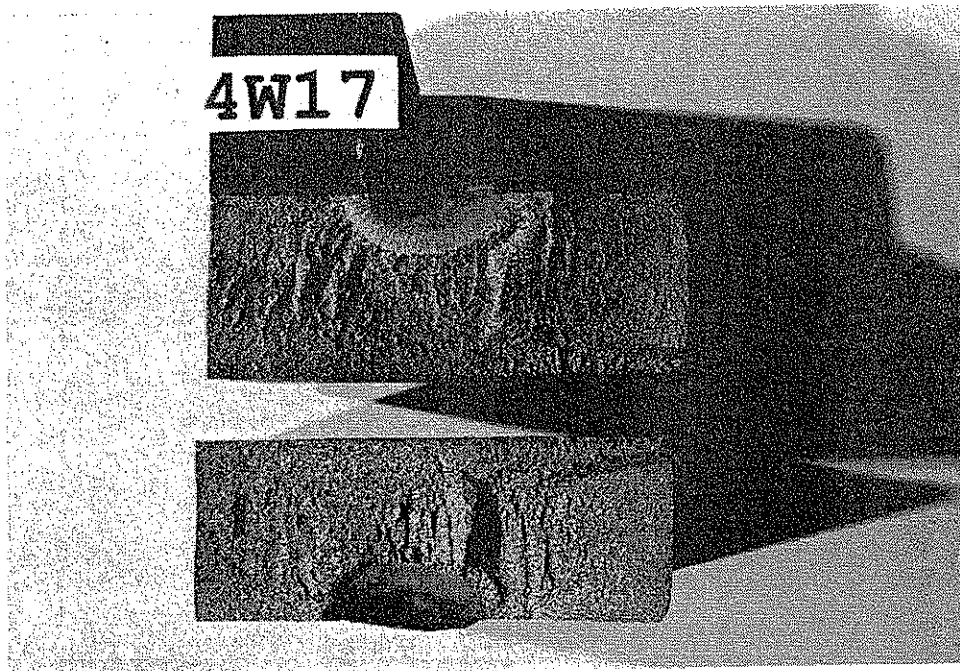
Fatigue crack at ground weld end detail 4W17.
